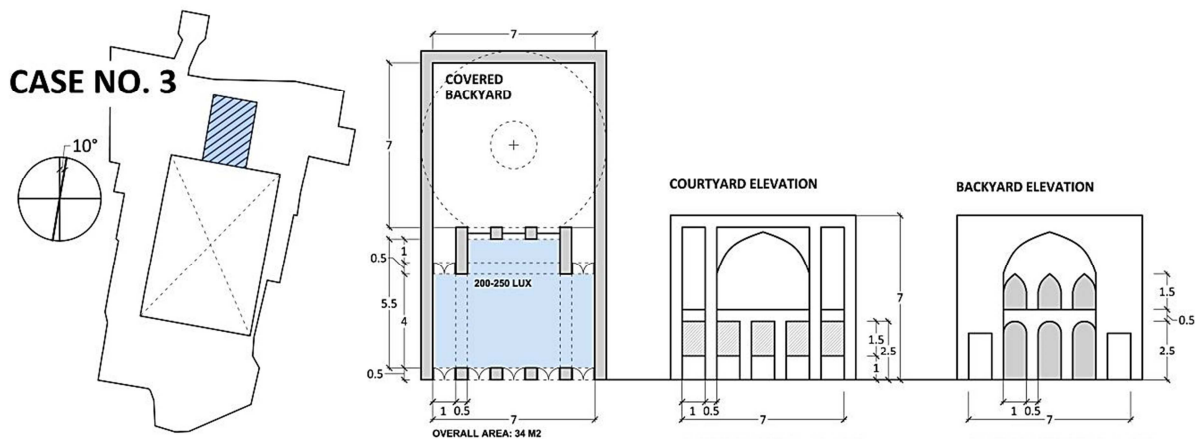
Two dimensional drawings, case no. 3. Drawn by author
